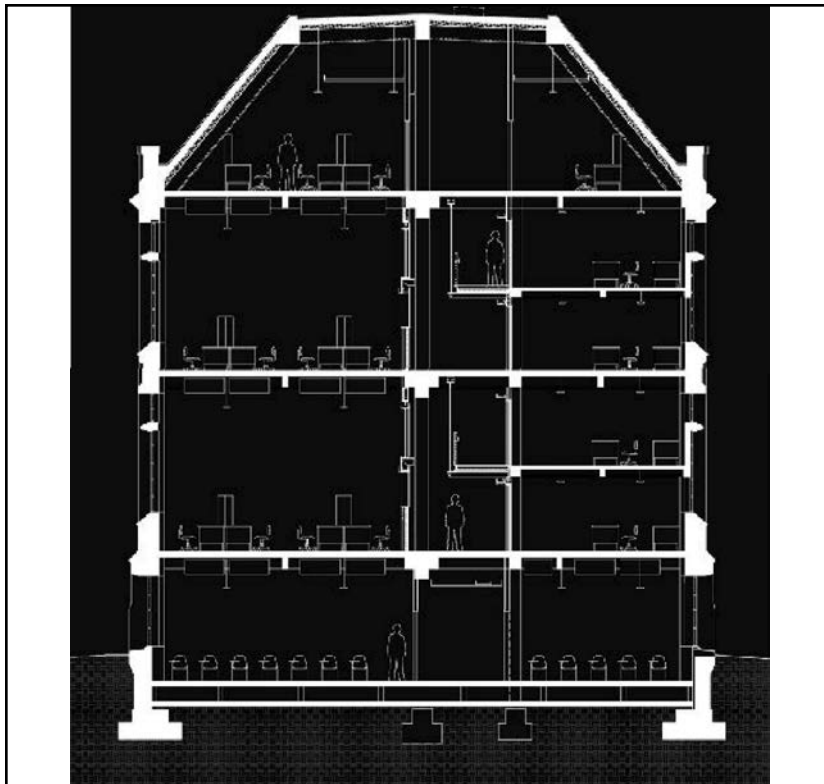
This section through Savery Hall reveals the mezzanines that are possible due to the large floor to floor height. Credit: SRG Partnership, 2008, courtesy of UW CPD.
